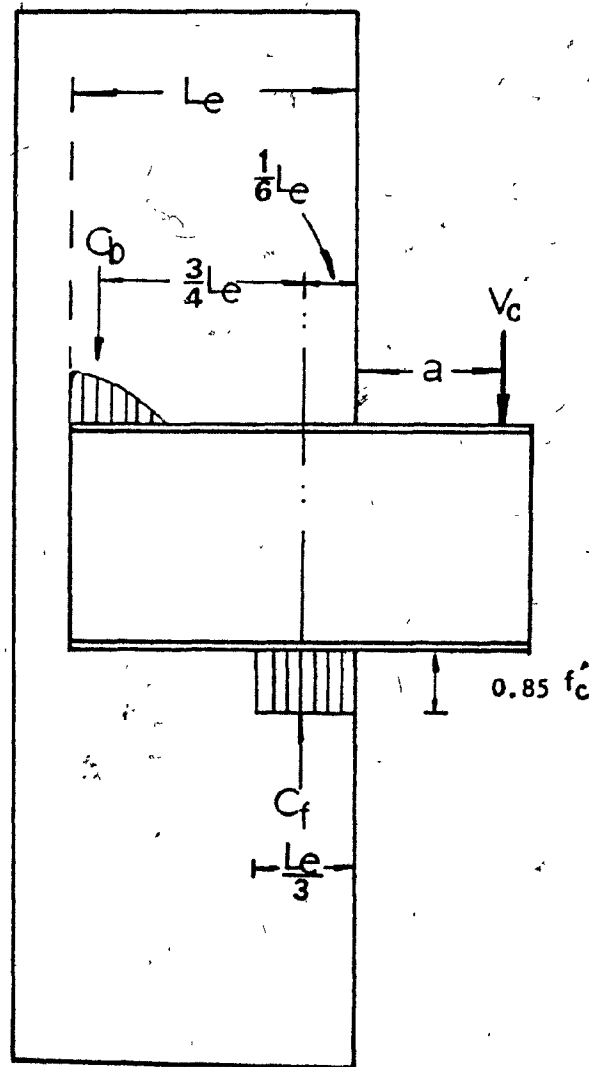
PCI stress distribution for steel members protruding from one side only
